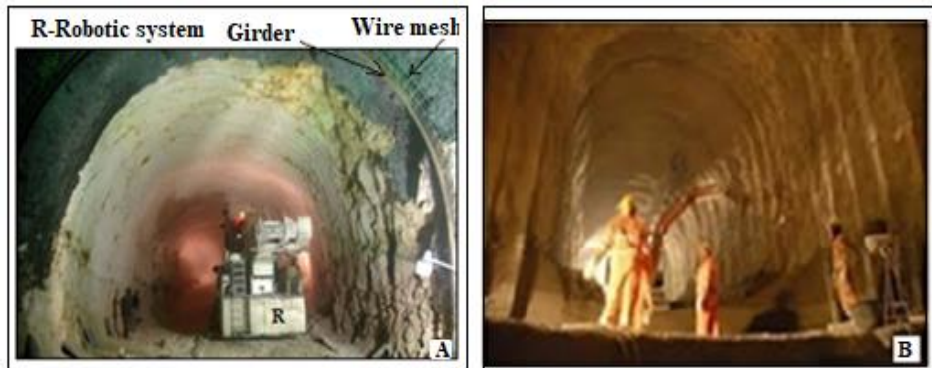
Robotic shotrecting , girders and wire mesh (A) and Primary support of shotcrete with lattice girders(B)
